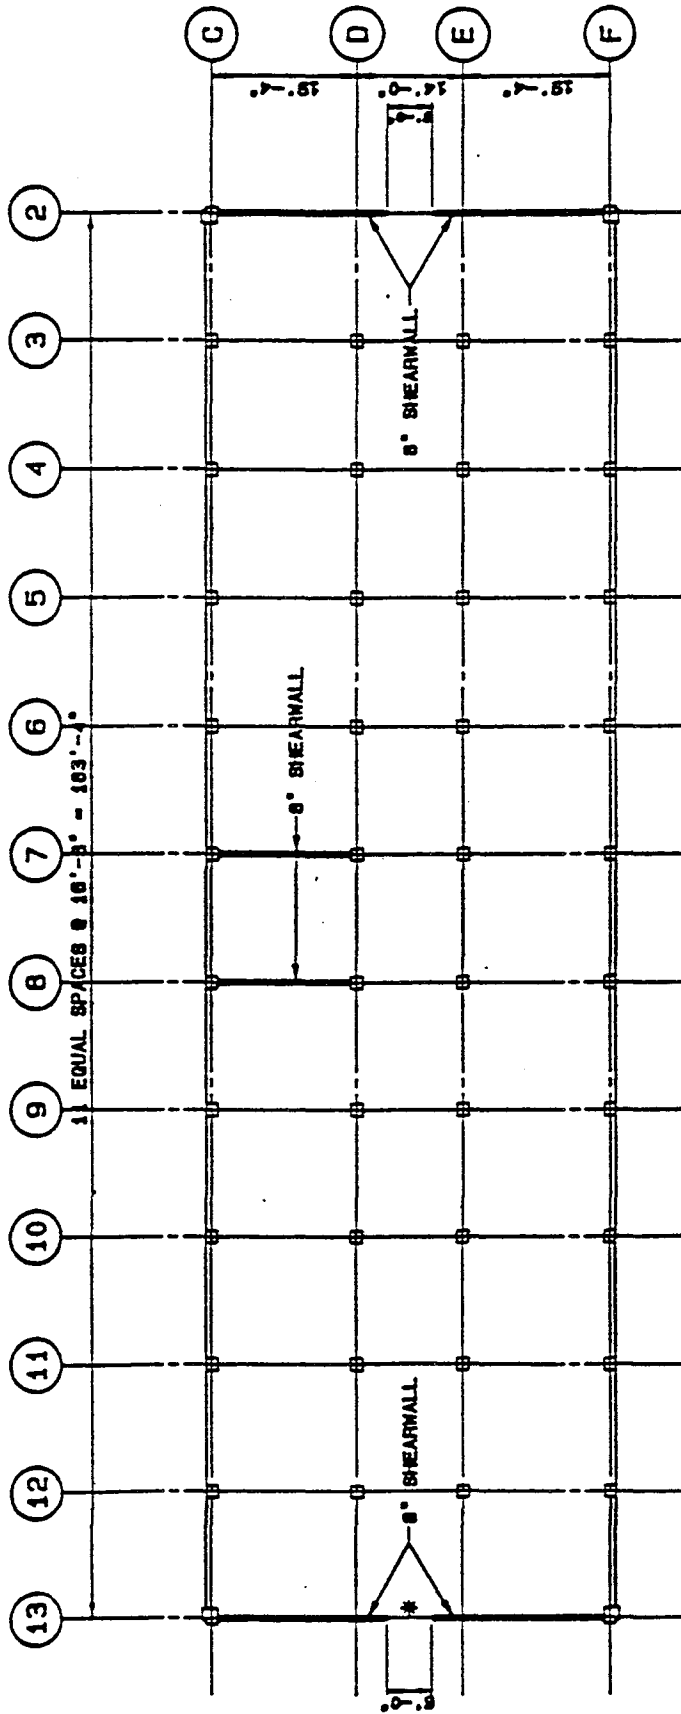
PLAN LAYOUT OF A CONCRETE MASONRY BUILDING
